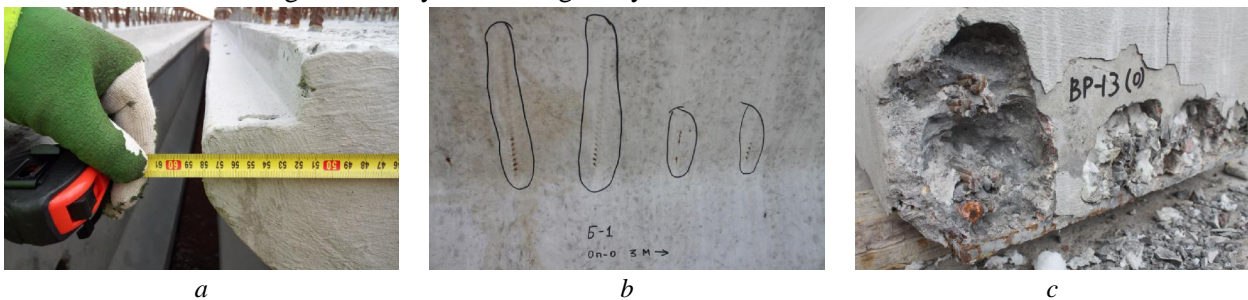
Defects found in reinforced concrete beams: a – reducing the width of the upper beam belt by 20 mm; b – insufficient thickness of the concrete protective layer of the distribution reinforcement near the top flange ; c – consequences of using polyurethane foam for the formwork sealing at the end of the beam in the bottom flange
